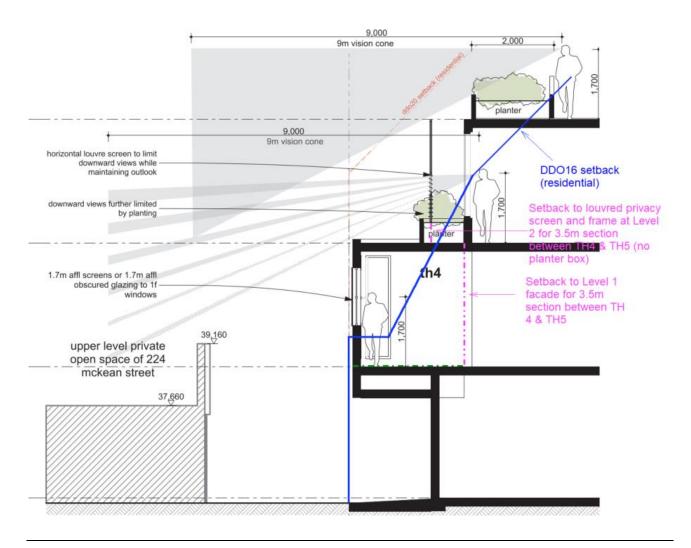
Section through Townhouse 4 showing extent of compliance with DDO20 and proposed DDO16 setbacks to NRZ.
